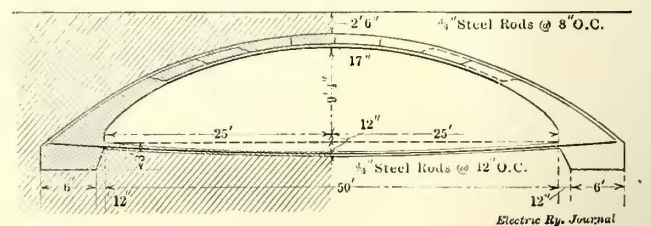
Bridge Reconstruction on Columbus & Lake Michigan Railway—Cross-section of Bridge 943.
